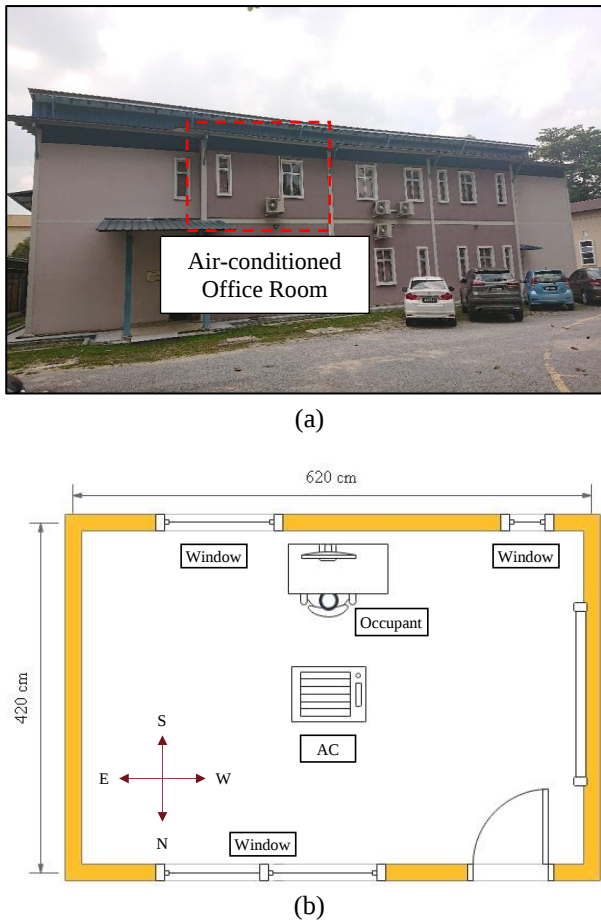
(a) Front façade and (b) Floor plan of the air-conditioned office room
